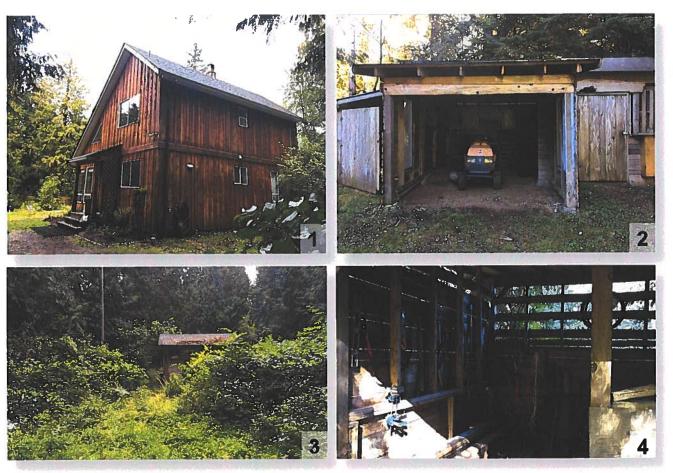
Photos of existing buildings: (1) house, (2) carport, (3) outbuilding, (4) shed.
